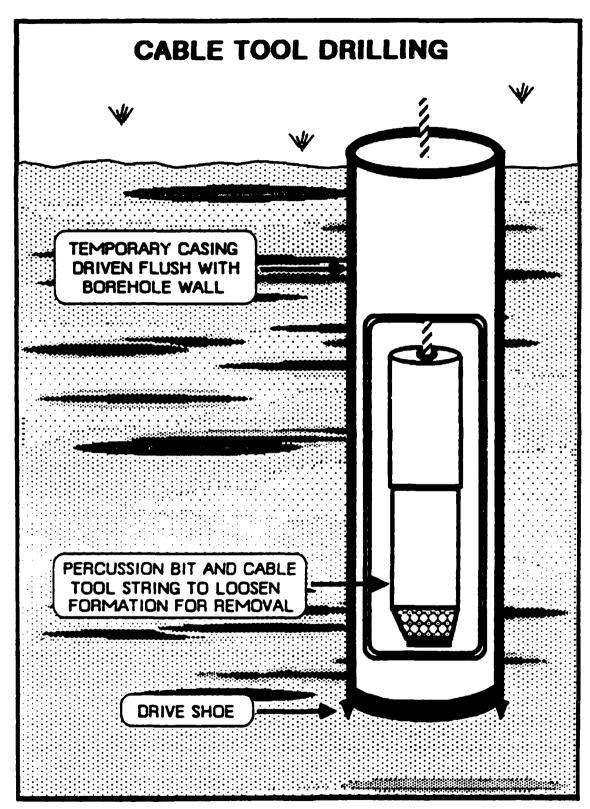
Cut-Away Sketch of Cable Tool Drilling Method (25:62)
